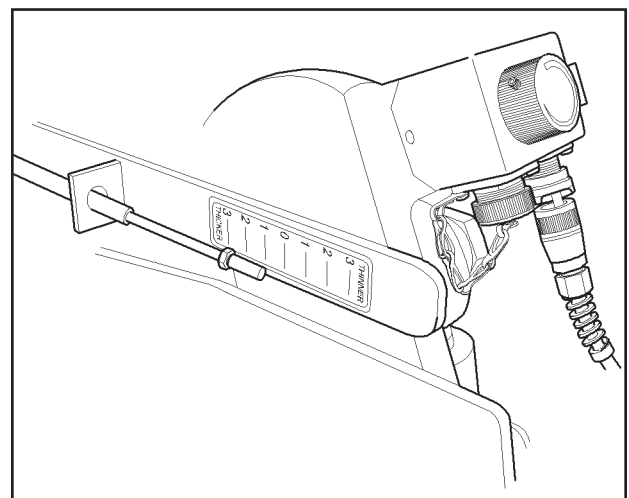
SONIC AUGER ADJUSTMENT
